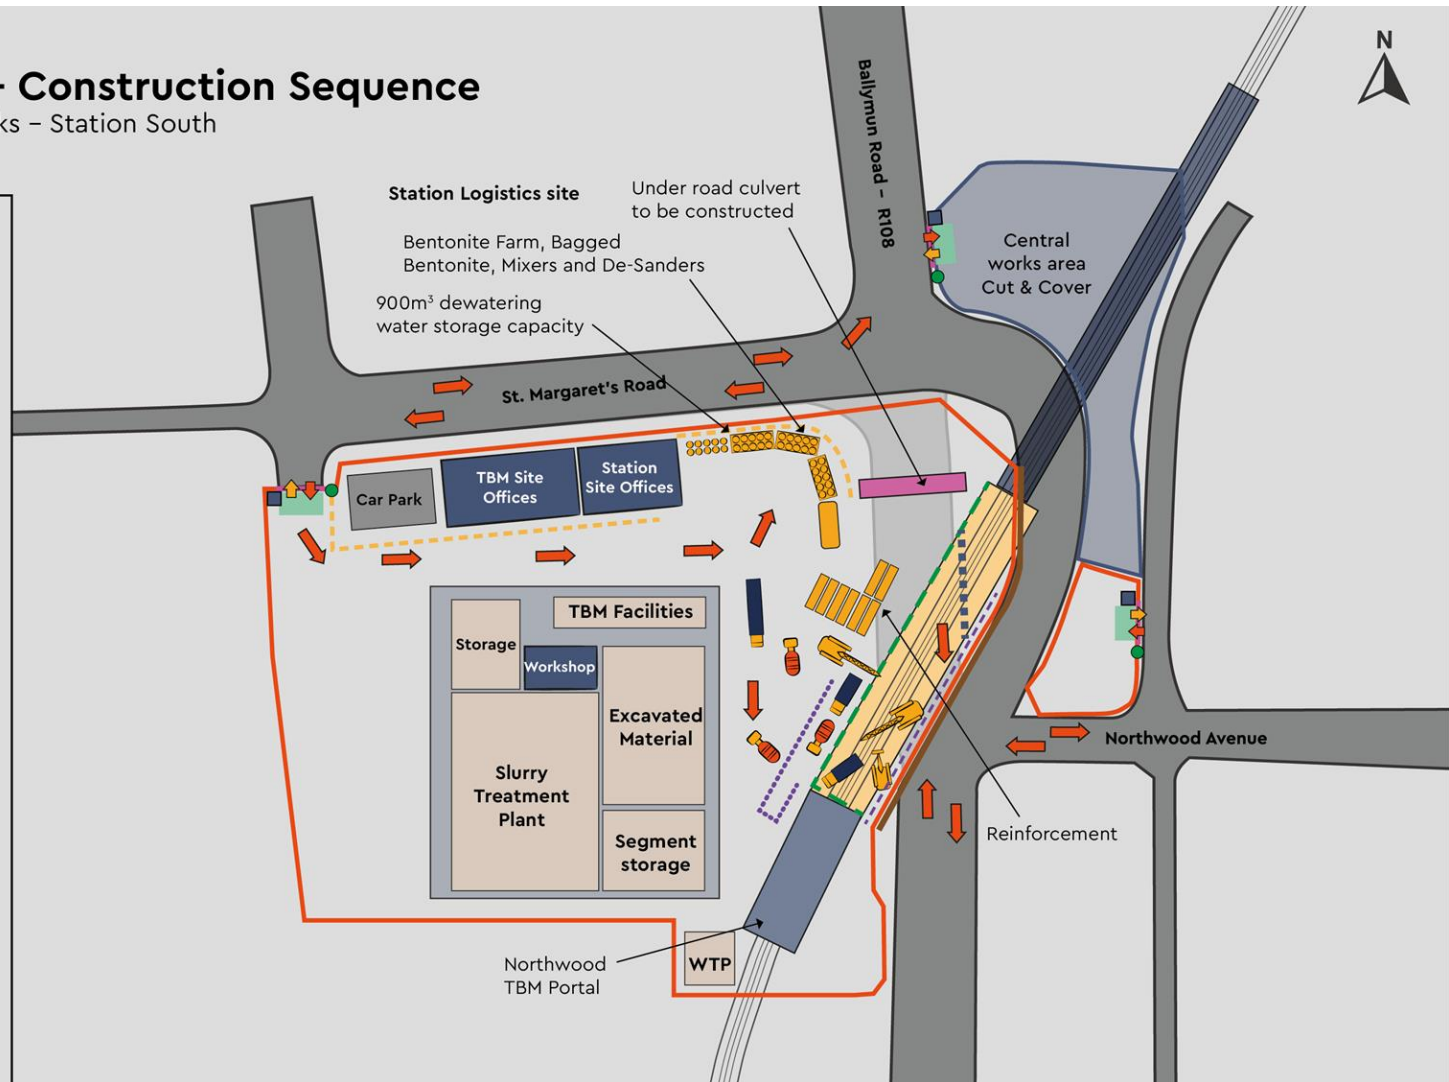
Northwood Station and Portal Stage 2 - Diaphragm and Piling Works
